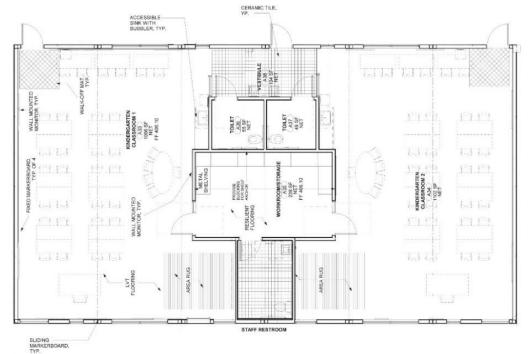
Sample Preschool, TK and Kindergarten Classroom Floor Plan
